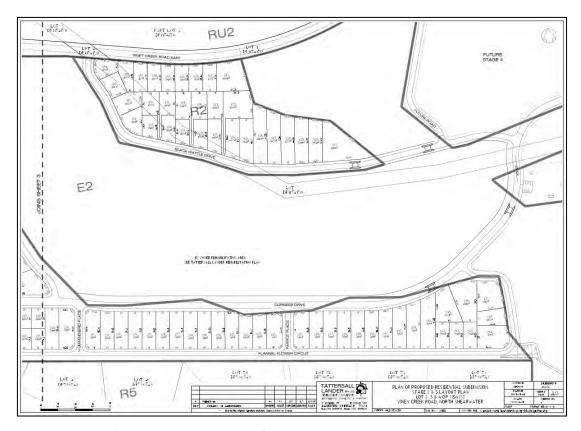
Tattersall Lander Plan Stages Two and Three planned subdivision
